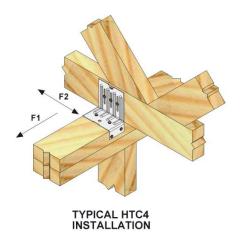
HTC HEAVY TRUSS CLIPS
